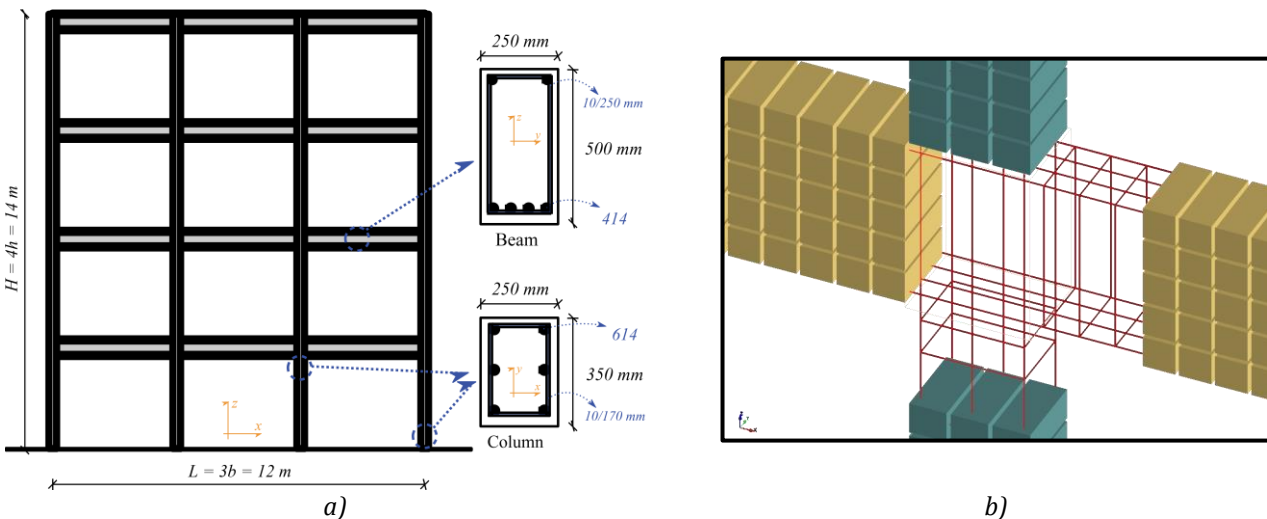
a) The reference prototype numerical frame, E1, of the RC frames used in the modeling and removal study, and b) a screenshot from ELS showing steel detailing and element division at beam-column joints
